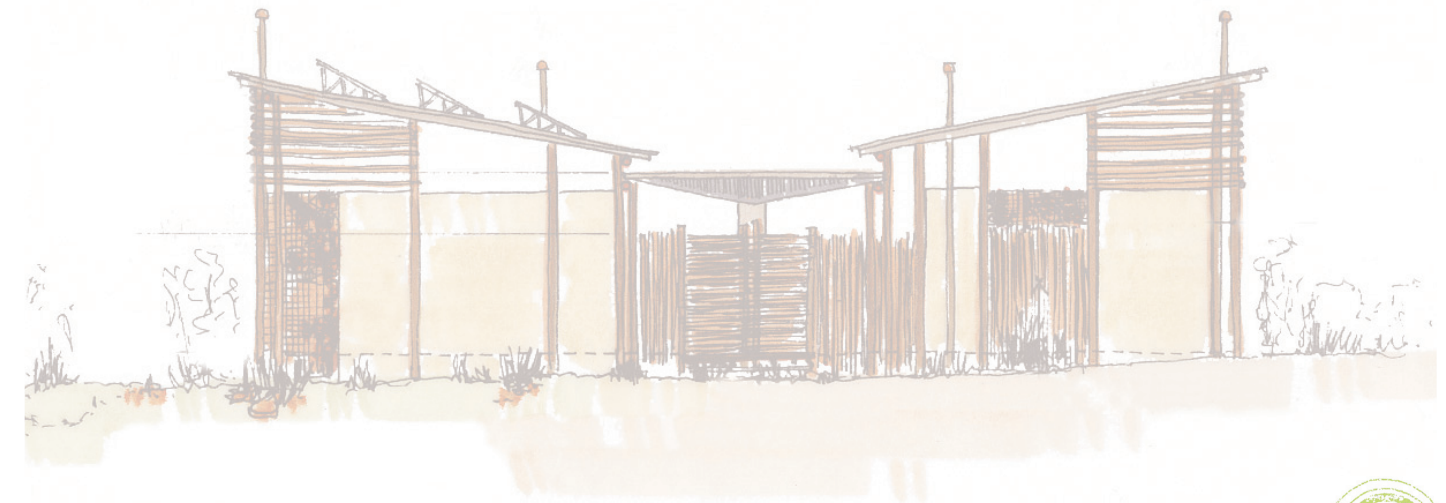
Sandbag and oil drum wall in Restaurant
